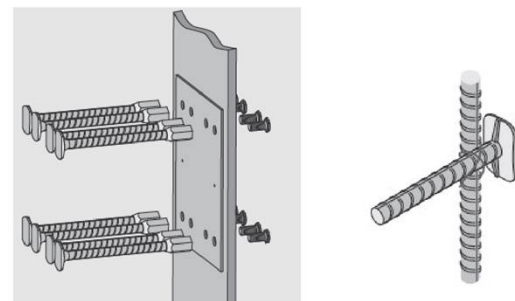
Fix HSC-B socket bars with mounting template and hexagonal screws to the formwork, wire-tied the socket bars to the element reinforcement
